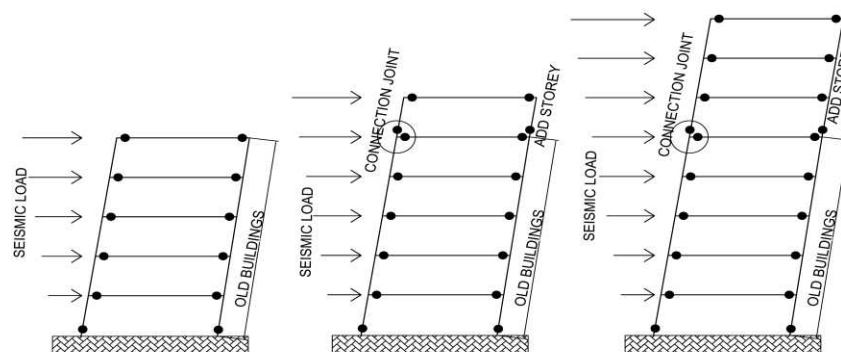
Display of the plastic cracks on the old building and the building with added floors.
